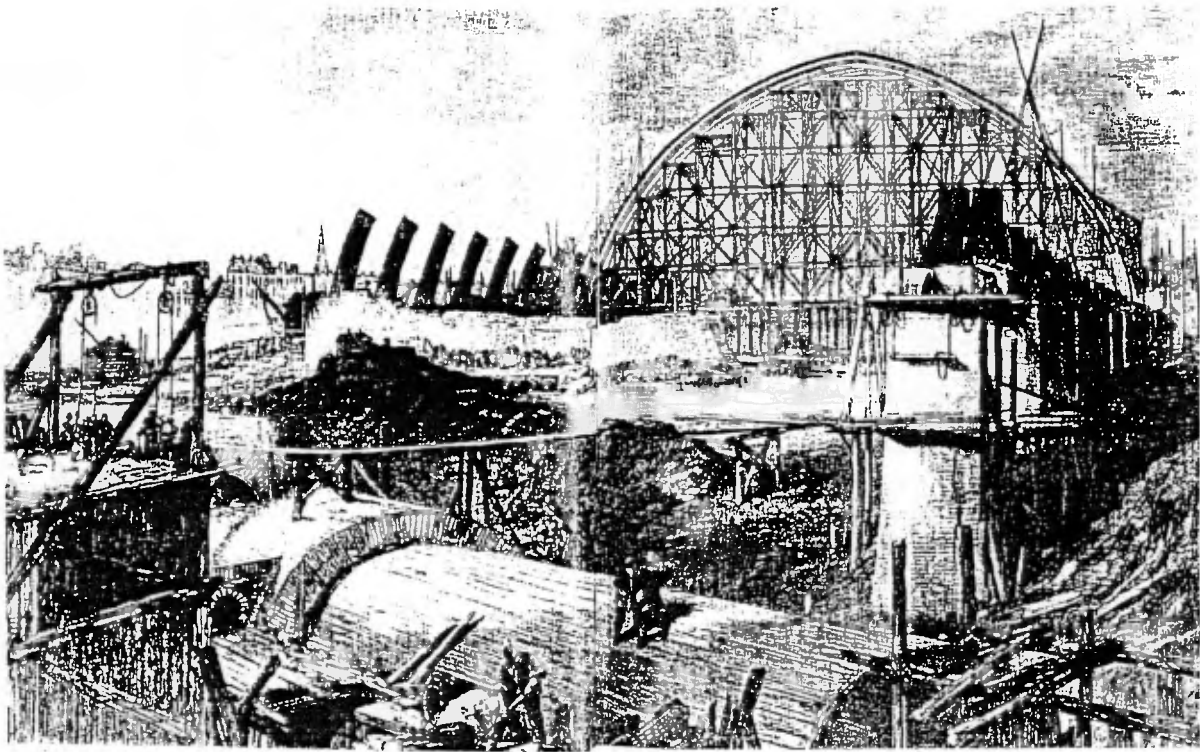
St Pancras Station under construction showing the Fleet sewer (foreground) and the outer brick walls of the station, one almost completed wrought iron rib, with the wooden scaffolding used in its erection, and the lower part of several other ribs.
